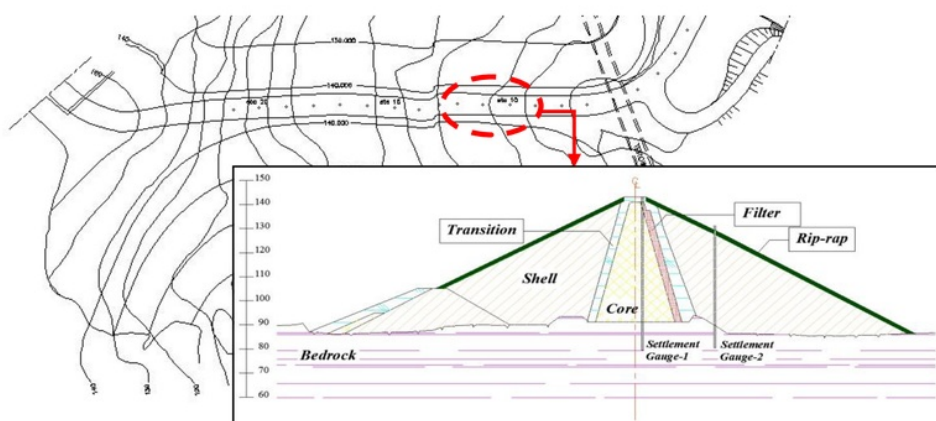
Sermo Dam's Layout; Inset: Cross Section Sta 15 and Location of settlement gauge [3]
